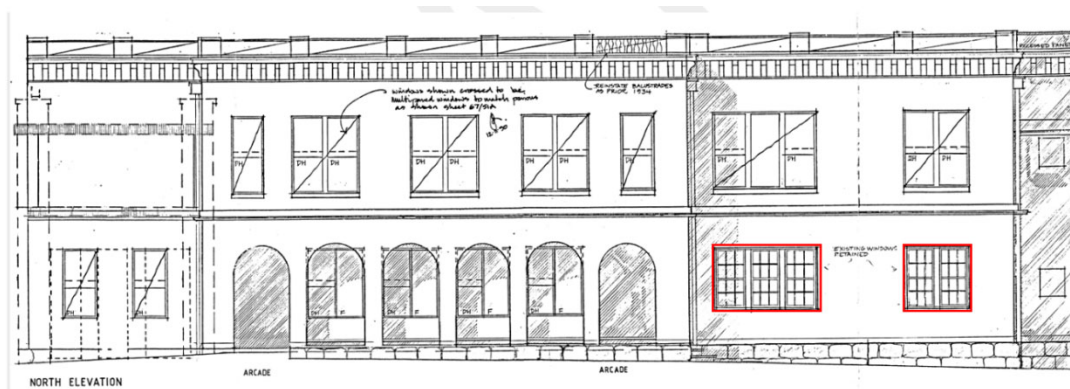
Plan showing reconstruction of the Powell Wing (northern façade). The surviving original windows are outlined in red. (Source: McGlashan & Everist & Daryl Jackson 1990 with GML Heritage overlay)
